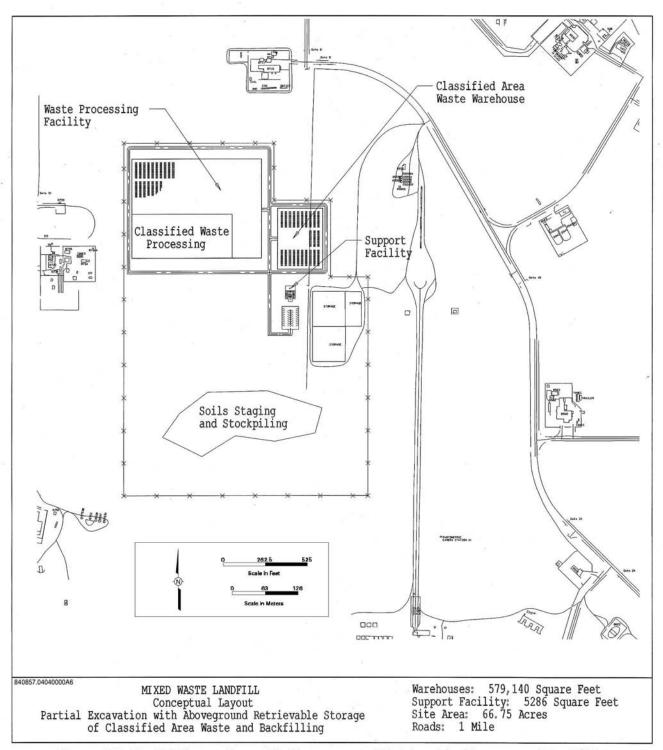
Partial Excavation with Aboveground Retrievable Storage and Backfilling
